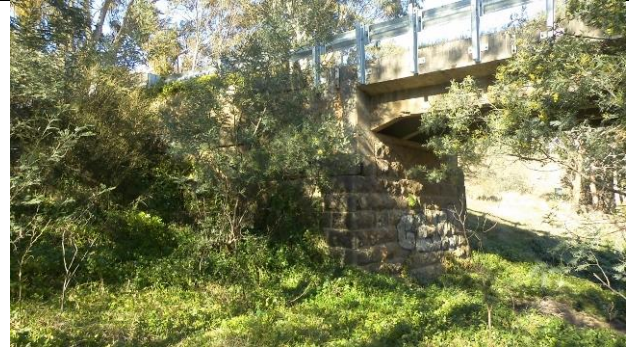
Looking north-west at Coopers Bridge showing the west side abutment.
